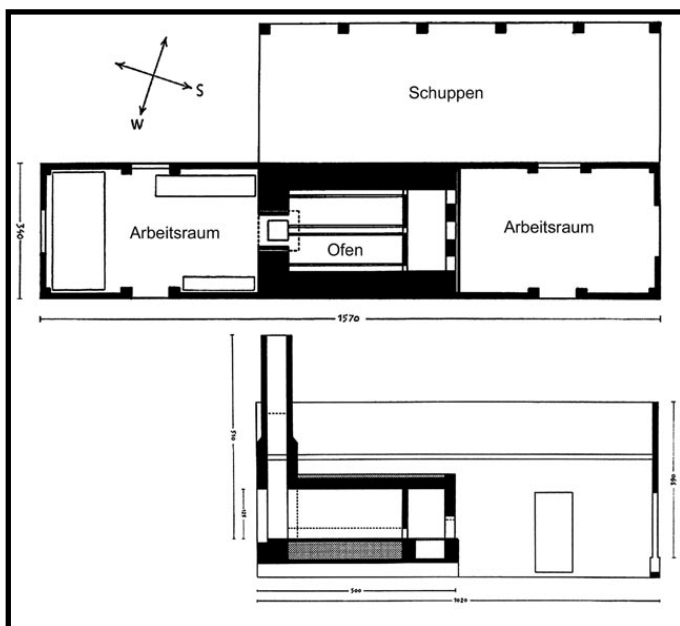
Horizontal cross-draught earthenware kiln with a vertical fire-grate and a rectangular ground plan, firing chamber floor with temporarily installed flues. Hellern, Nordrhein-Westfalen D, Töpferei Ahaus, around 1925 (Segschneider 1976, 117 und 122)
